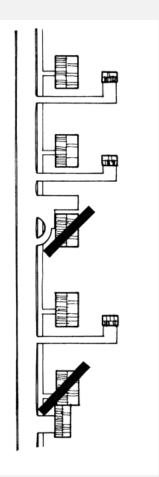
The placement of new parking areas should be compatible with the predominant placement on the site
